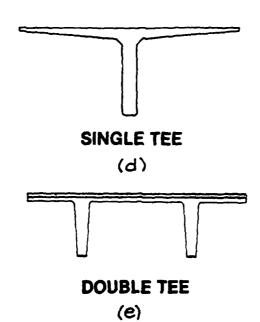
Floor and Roof Slabs (Ref. 16).
